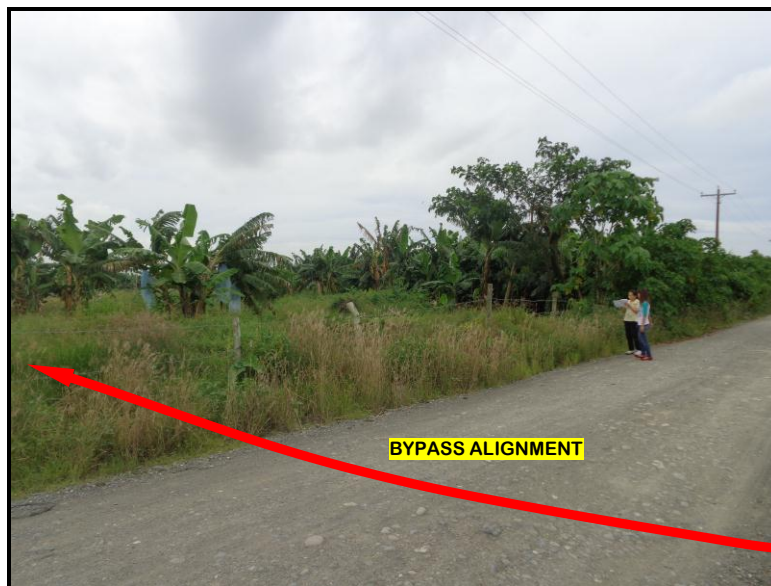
Bypass alignment traversing the Dole Fresh Fruit Banana Plantation in Brgy. Lasang between Sta. 41+800-42+000.
